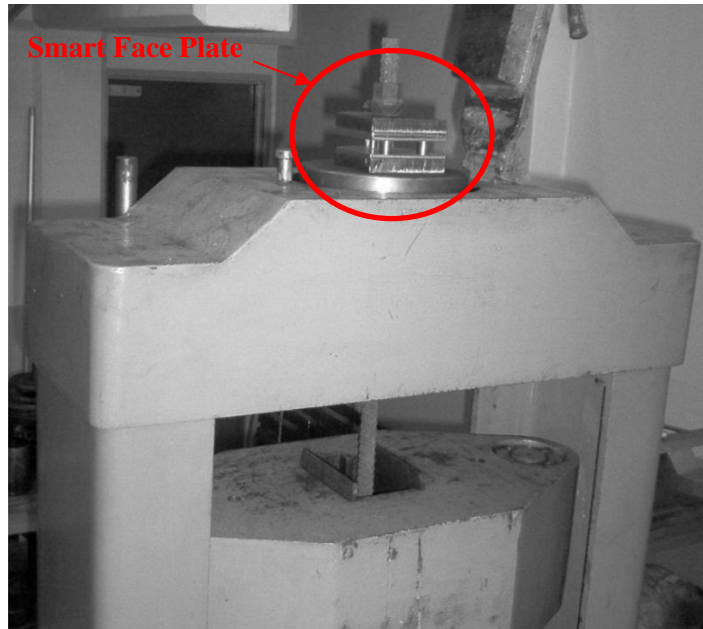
Smart face plate (at top) being tested in an Avery tensile testing machine.
